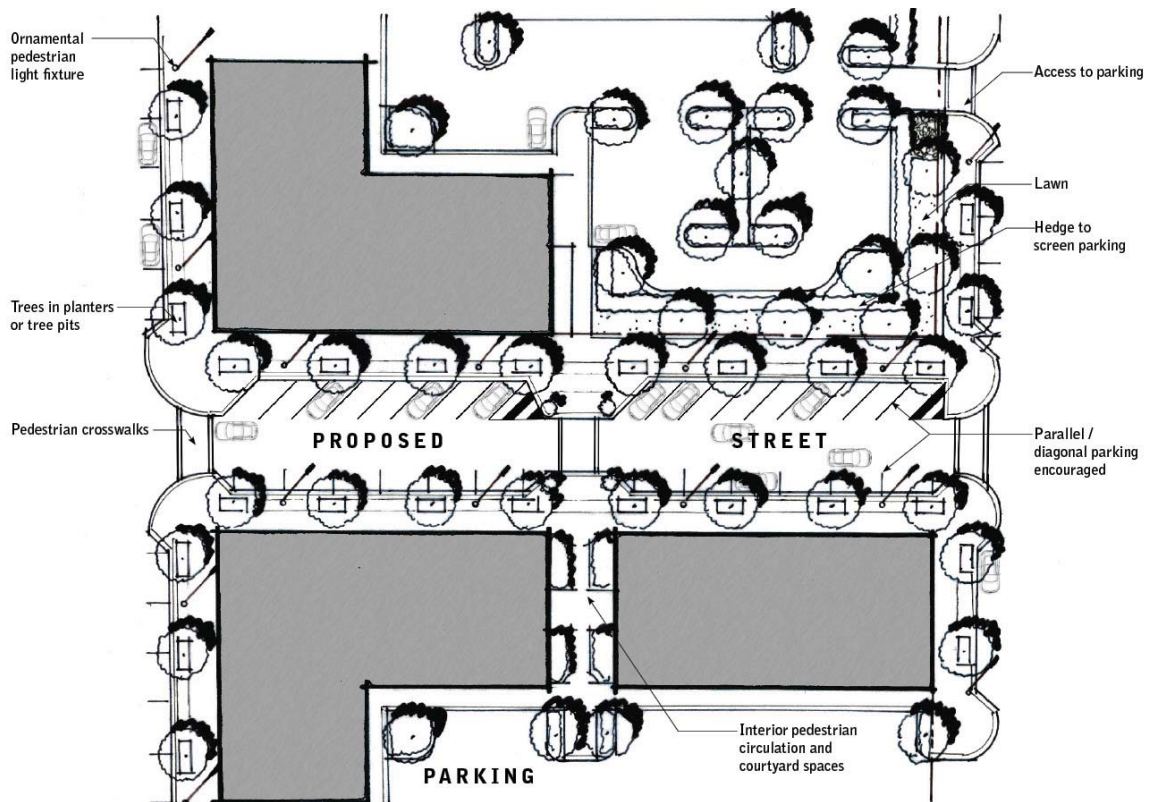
J: Plan for Connector and Access Streets The above sketch illustrates desired conditions for Connector and Access Streets, with buildings oriented to street edges and parking lots lined with hedges and street trees to create a strong edge along the street. The sketch also illustrates the potential for on-street parking designed with parallel or angled spaces, as appropriate.
